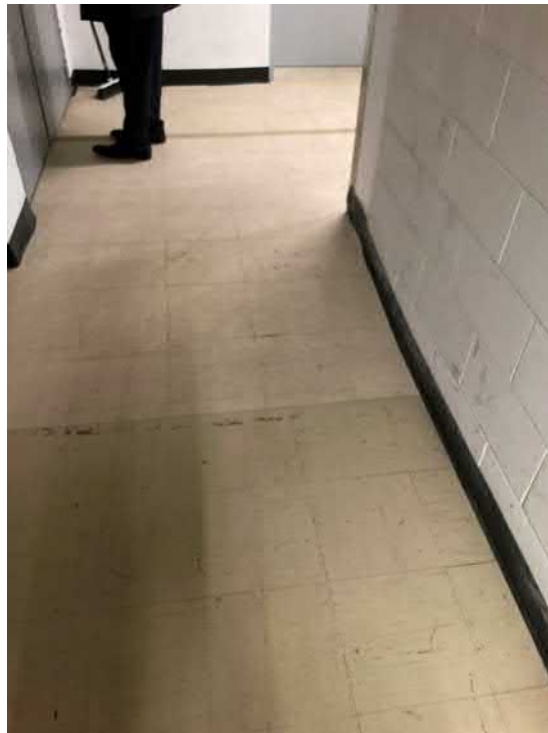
Basement interior showing VFTs and transition from original portion of building to 1985 addition
